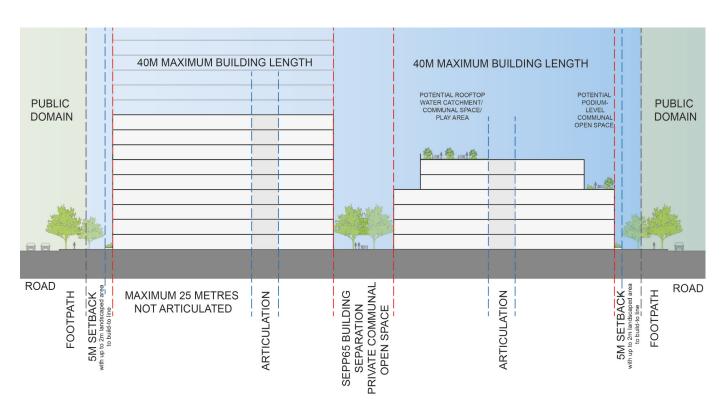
Section Illustration - Building Design Guidelines
